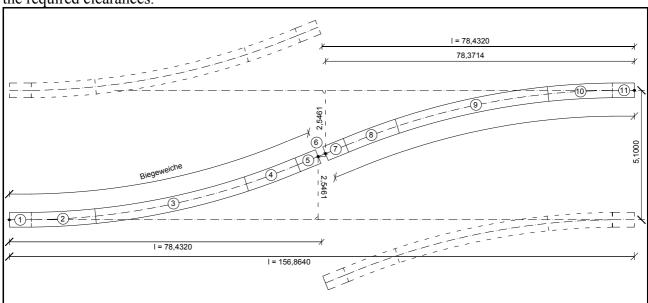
X-connection with low-speed switches (guideway pitch 5.10 m) (design example)
